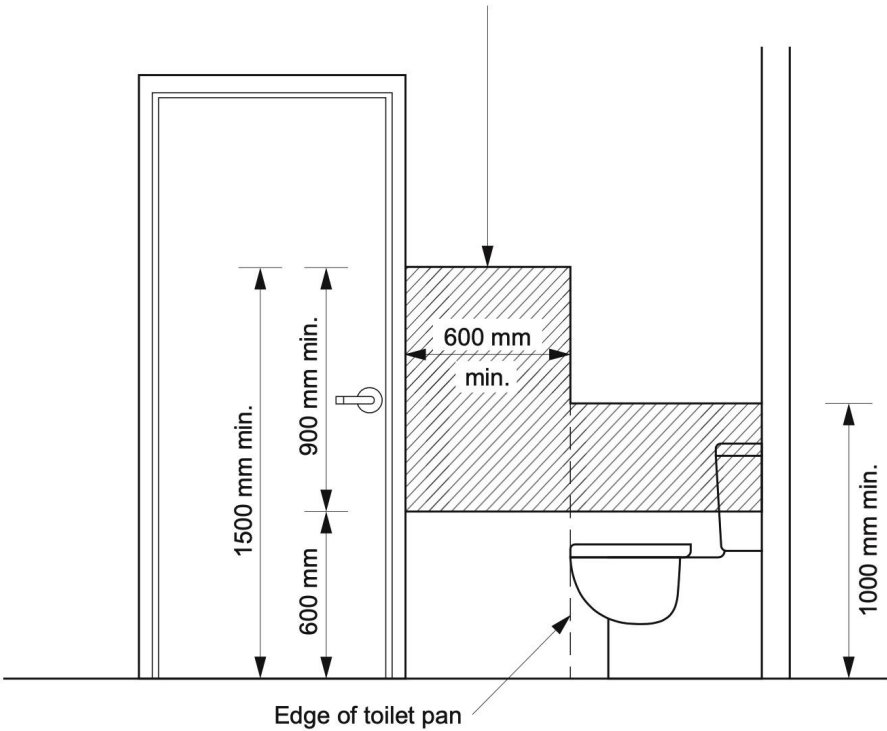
Location of noggings for a wall behind a toilet pan
